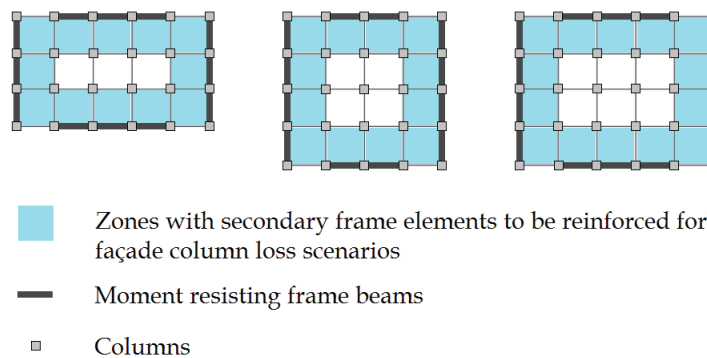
Plan view examples of zones to which to apply DR2 rules for secondary elements
